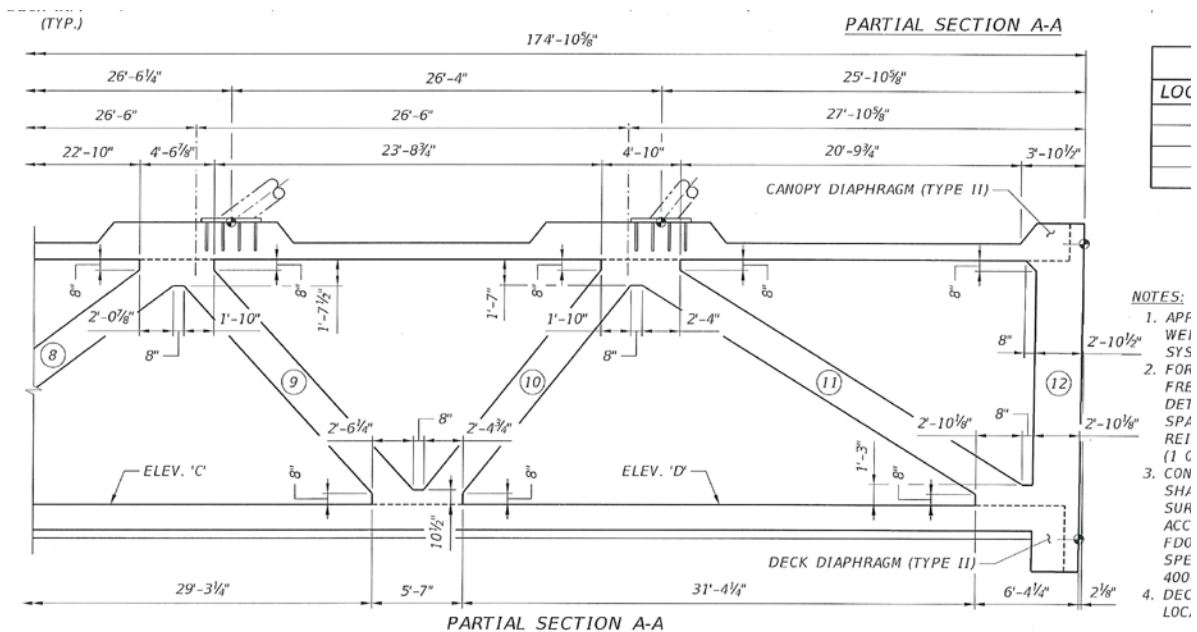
Truss member reinforcing at north end of span from RFC plan Sheet B-40.
